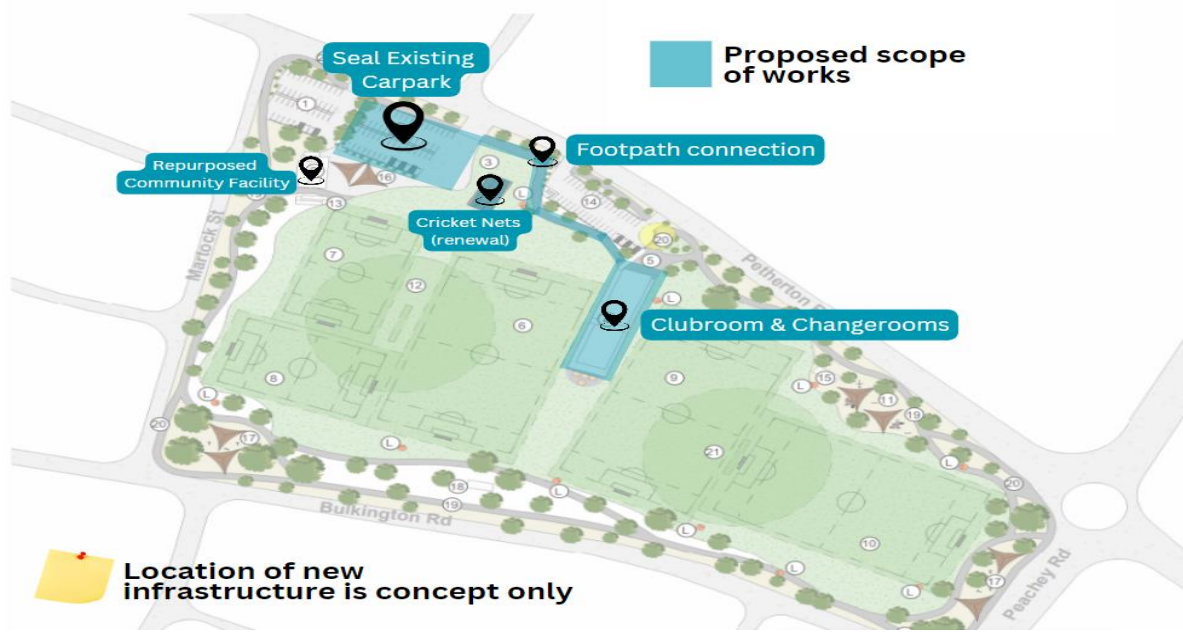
Kalara Reserve Concept Masterplan – Stage 1 Proposed Scope of Works
